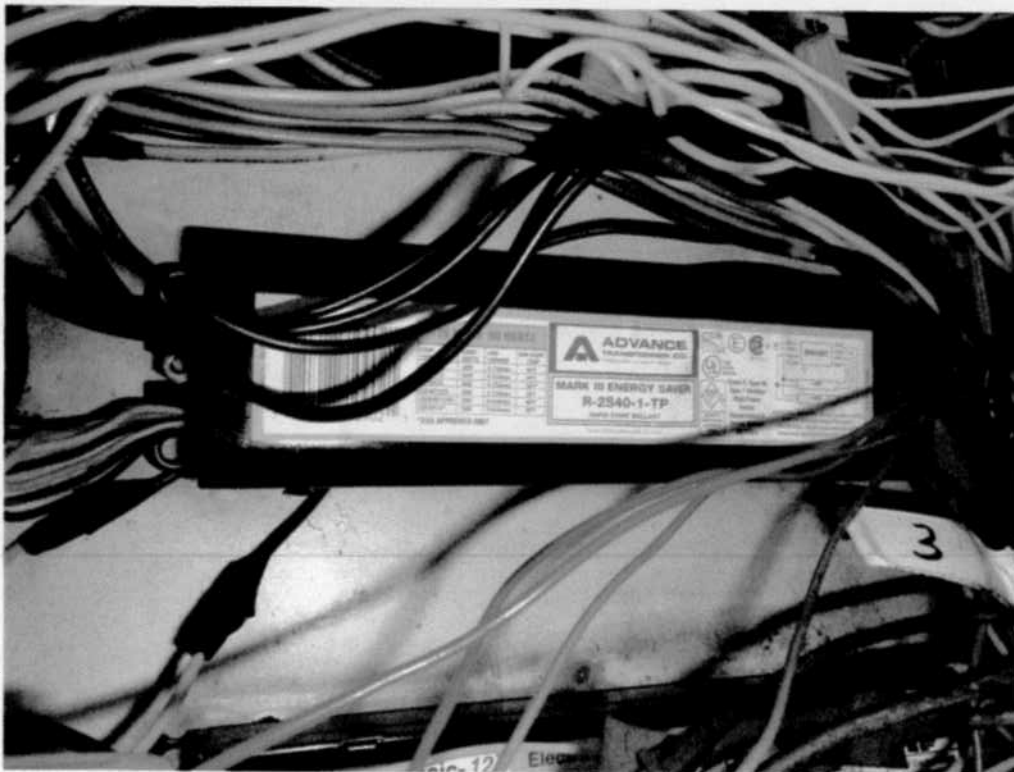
One magnetic ballast was found in the cabinet outside of Room 258.
